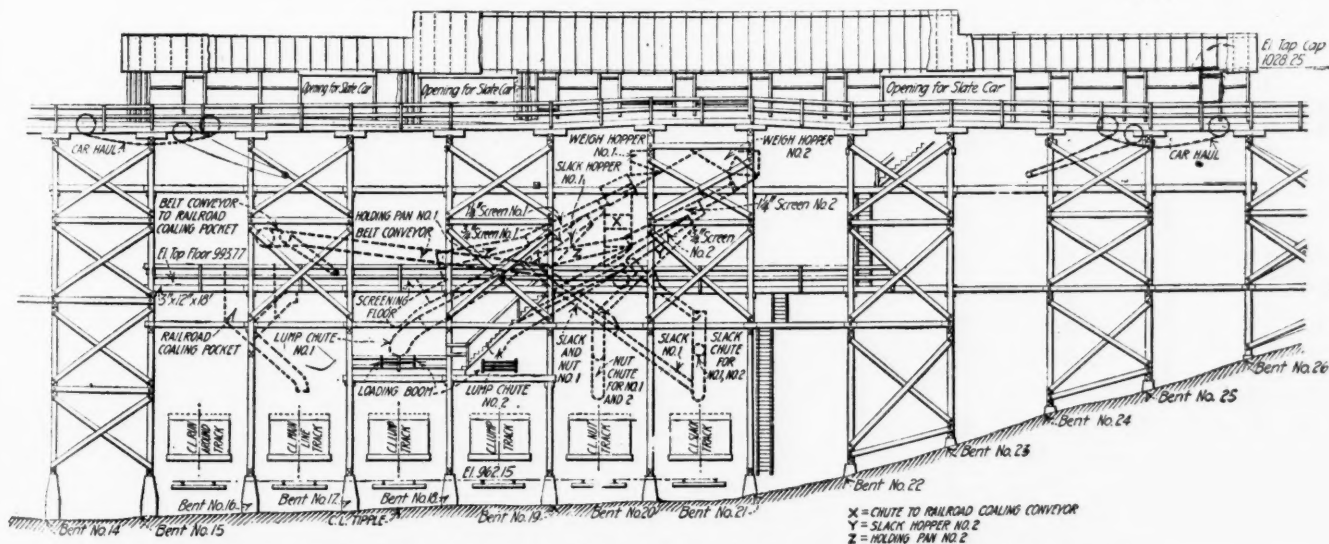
ELEVATION AT TIPPLE AND LOCATION OF COAL-HANDLING APPARATUS
